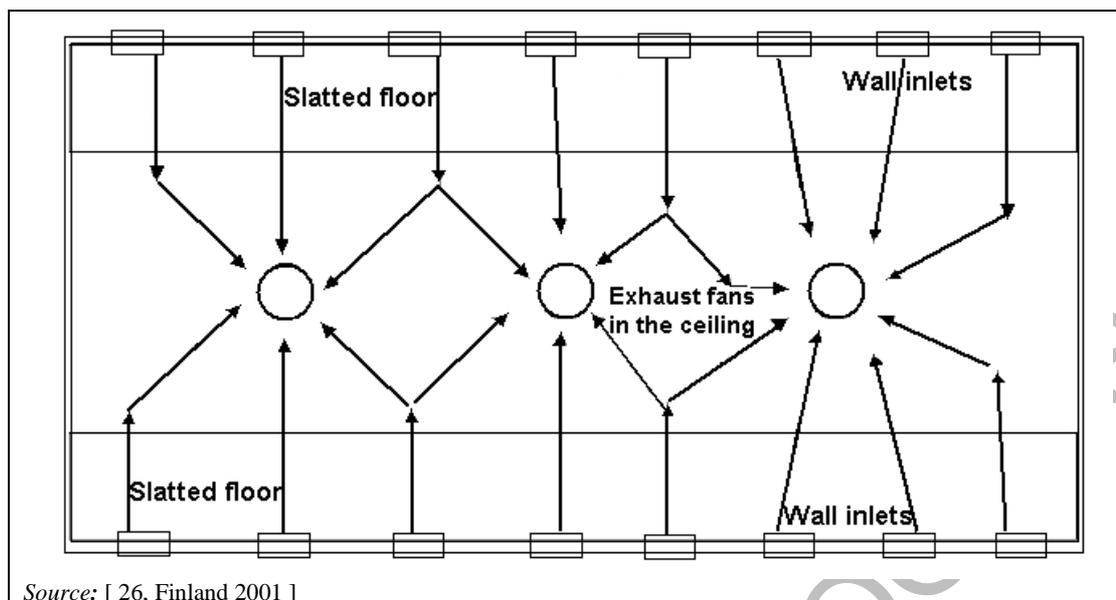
Schematic view picture of airflow in an exhaust ventilation system
